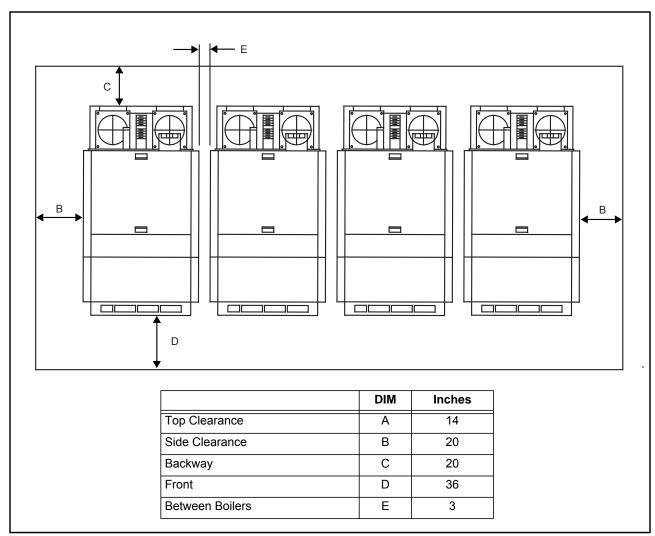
Model CFC Minimum Room Clearance Dimensions
